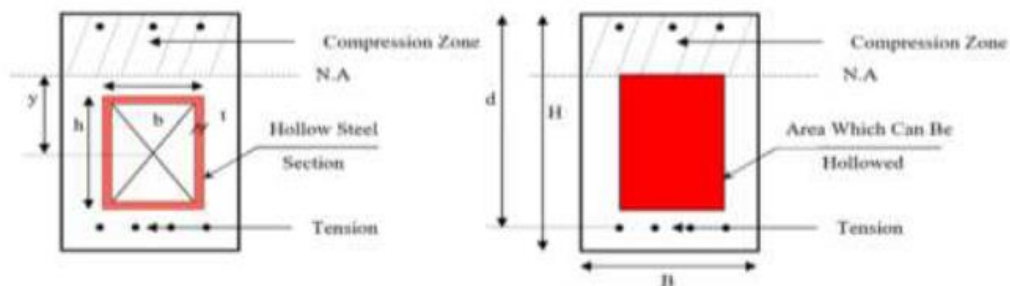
Typical section of the beams (El Basha et al., 2015)
